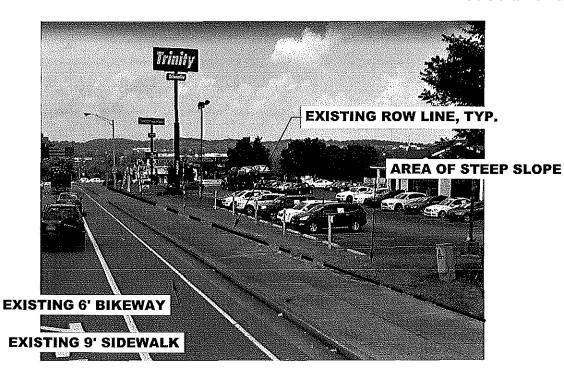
NORTH ALONG ROSA L PARKS BLVD
